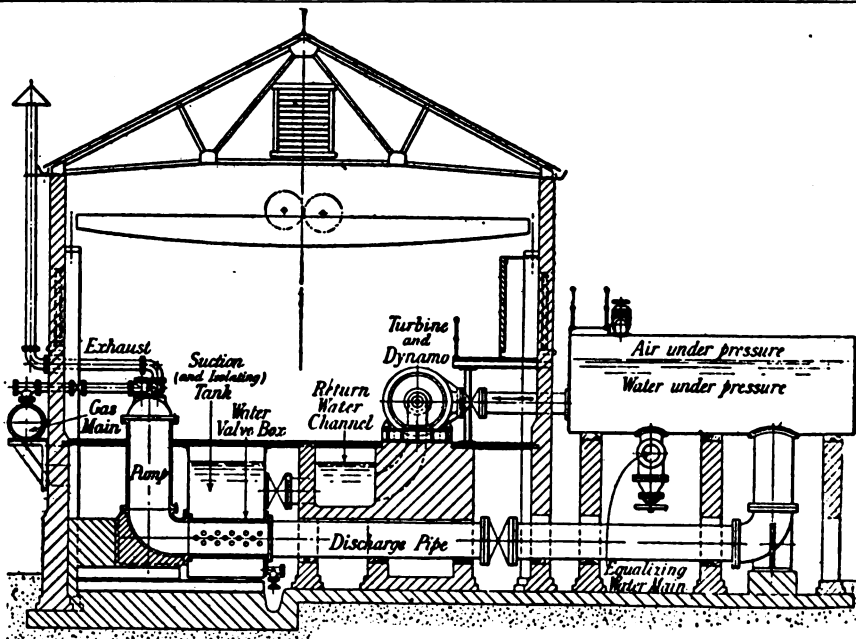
GAS PUMP DRIVEN POWER PLANT
